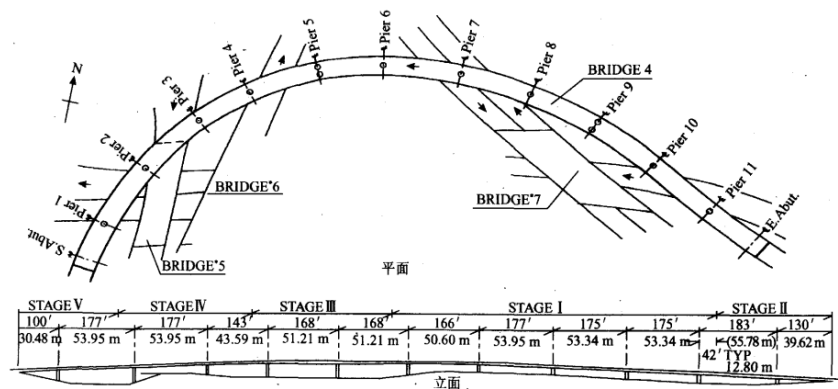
A long horizontally curved, post tensioned concrete highway bridge 420/QEW
